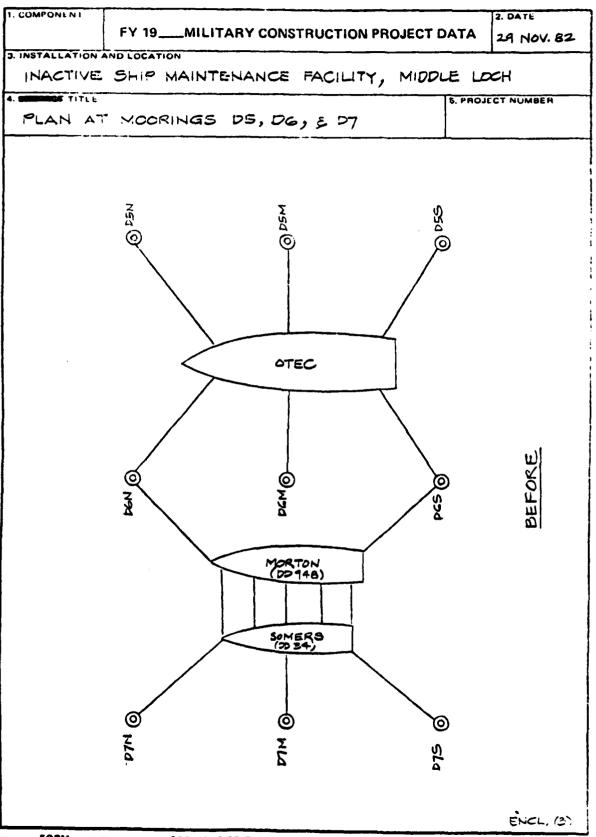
PEARL HARBOR FLEET MOORING LOCATION PLAN
